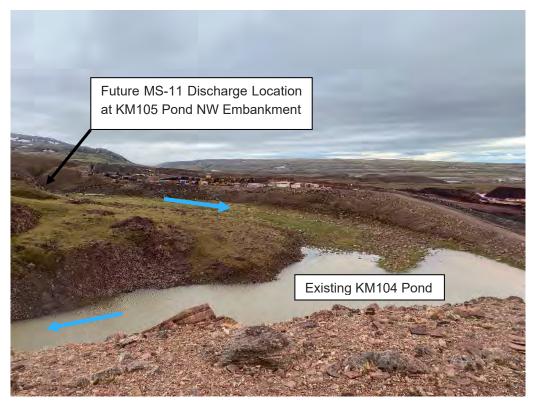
Flow Path from KM105 Pond to KM104 Pond
